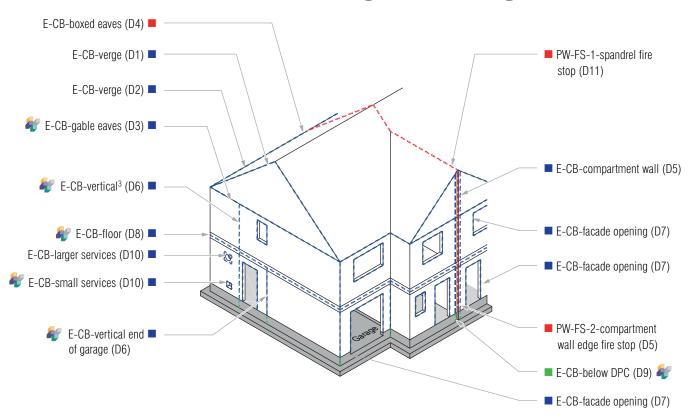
External weather facade to structural timber frame¹ cavity barrier locations⁴; single dwelling structure with uninhabited pitch roof space²
